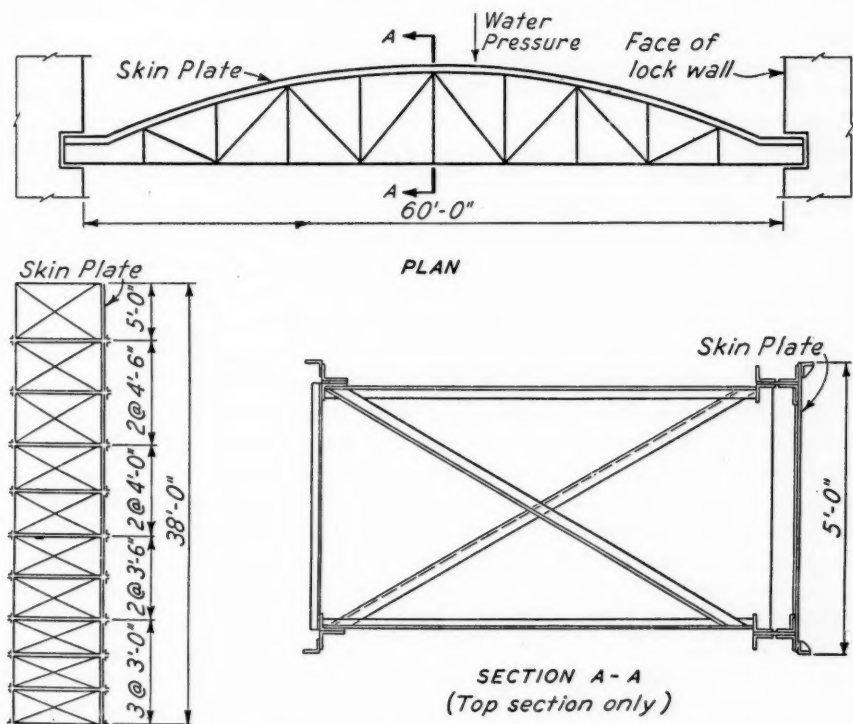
UNWATERING A DAM OF THE HORIZONTAL TRUSS AND SKIN PLATE TYPE, BASED ON THE INSTALLATION AT FORT LOUDOUN DAM ON THE TENNESSEE RIVER
